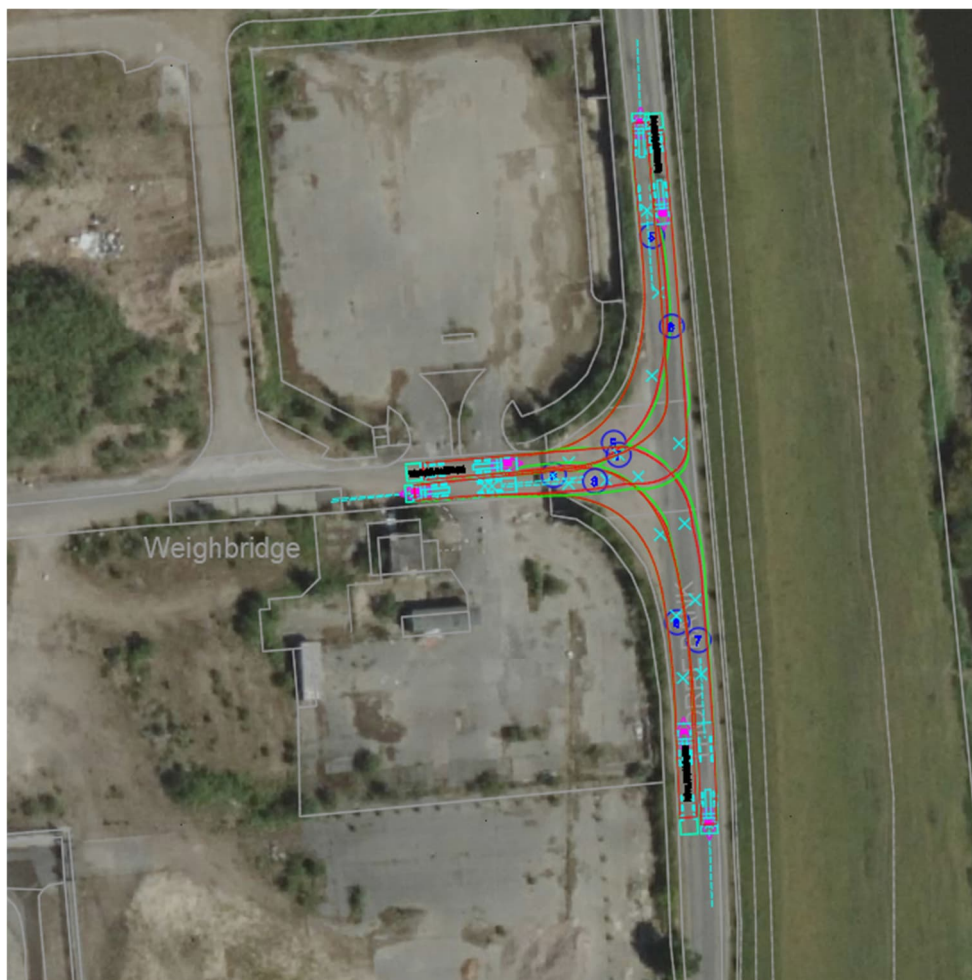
Existing Southern Access West off Thorpe Bank to the Existing National Grid Thorpe Marsh Substation and SPA
